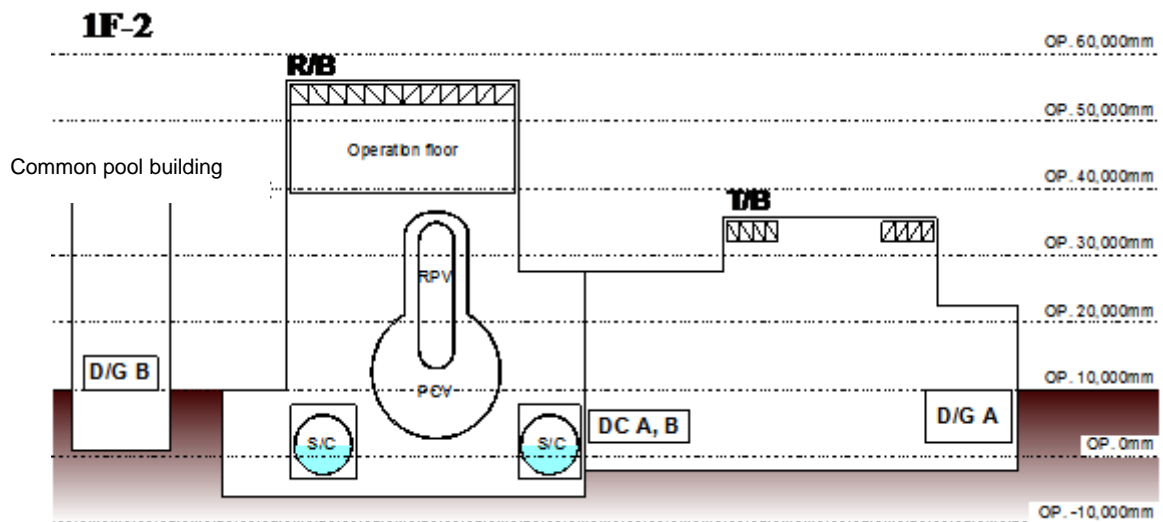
Building Cross-section for Unit 2, Fukushima Dai-ichi NPS
